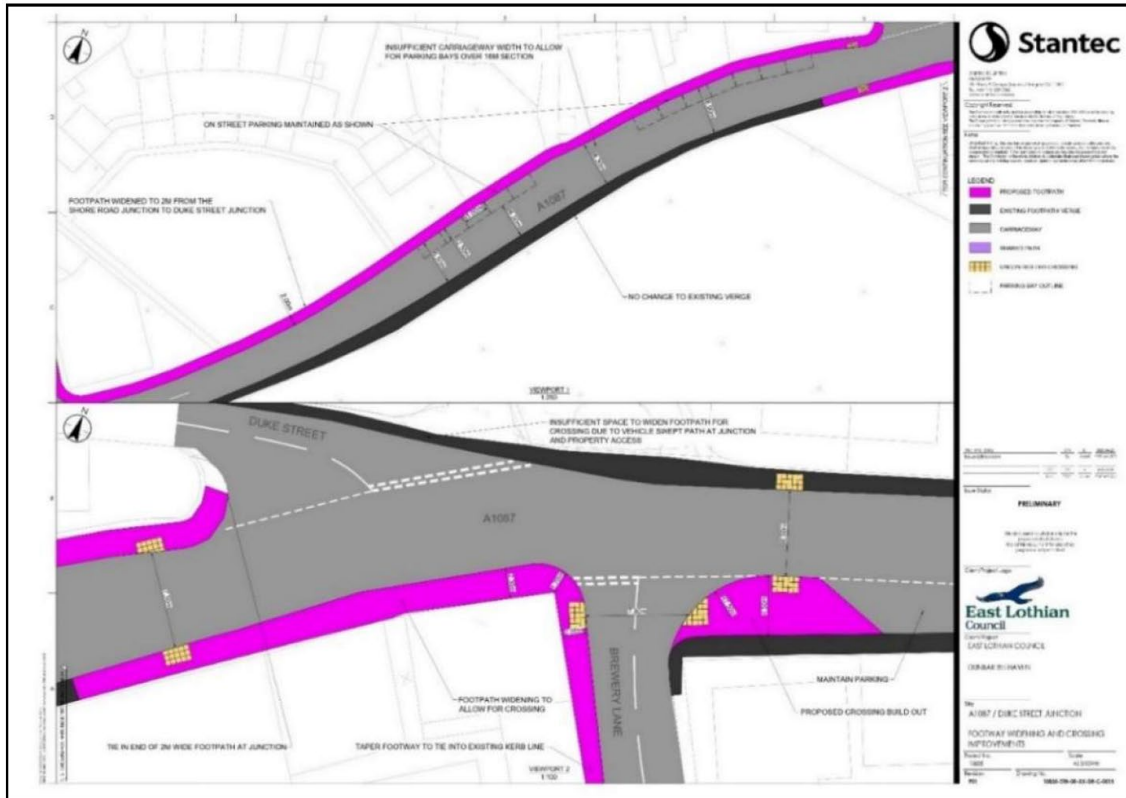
Pavement widening and crossing at Duke Street / Brewery Lane (Project E)
